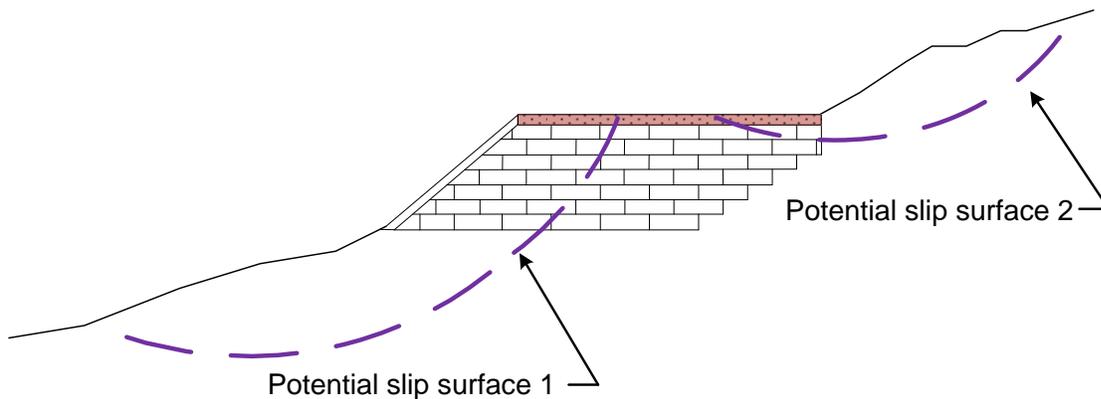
Static and seismic slope stability involving both the fill mass and existing soil slope material.
